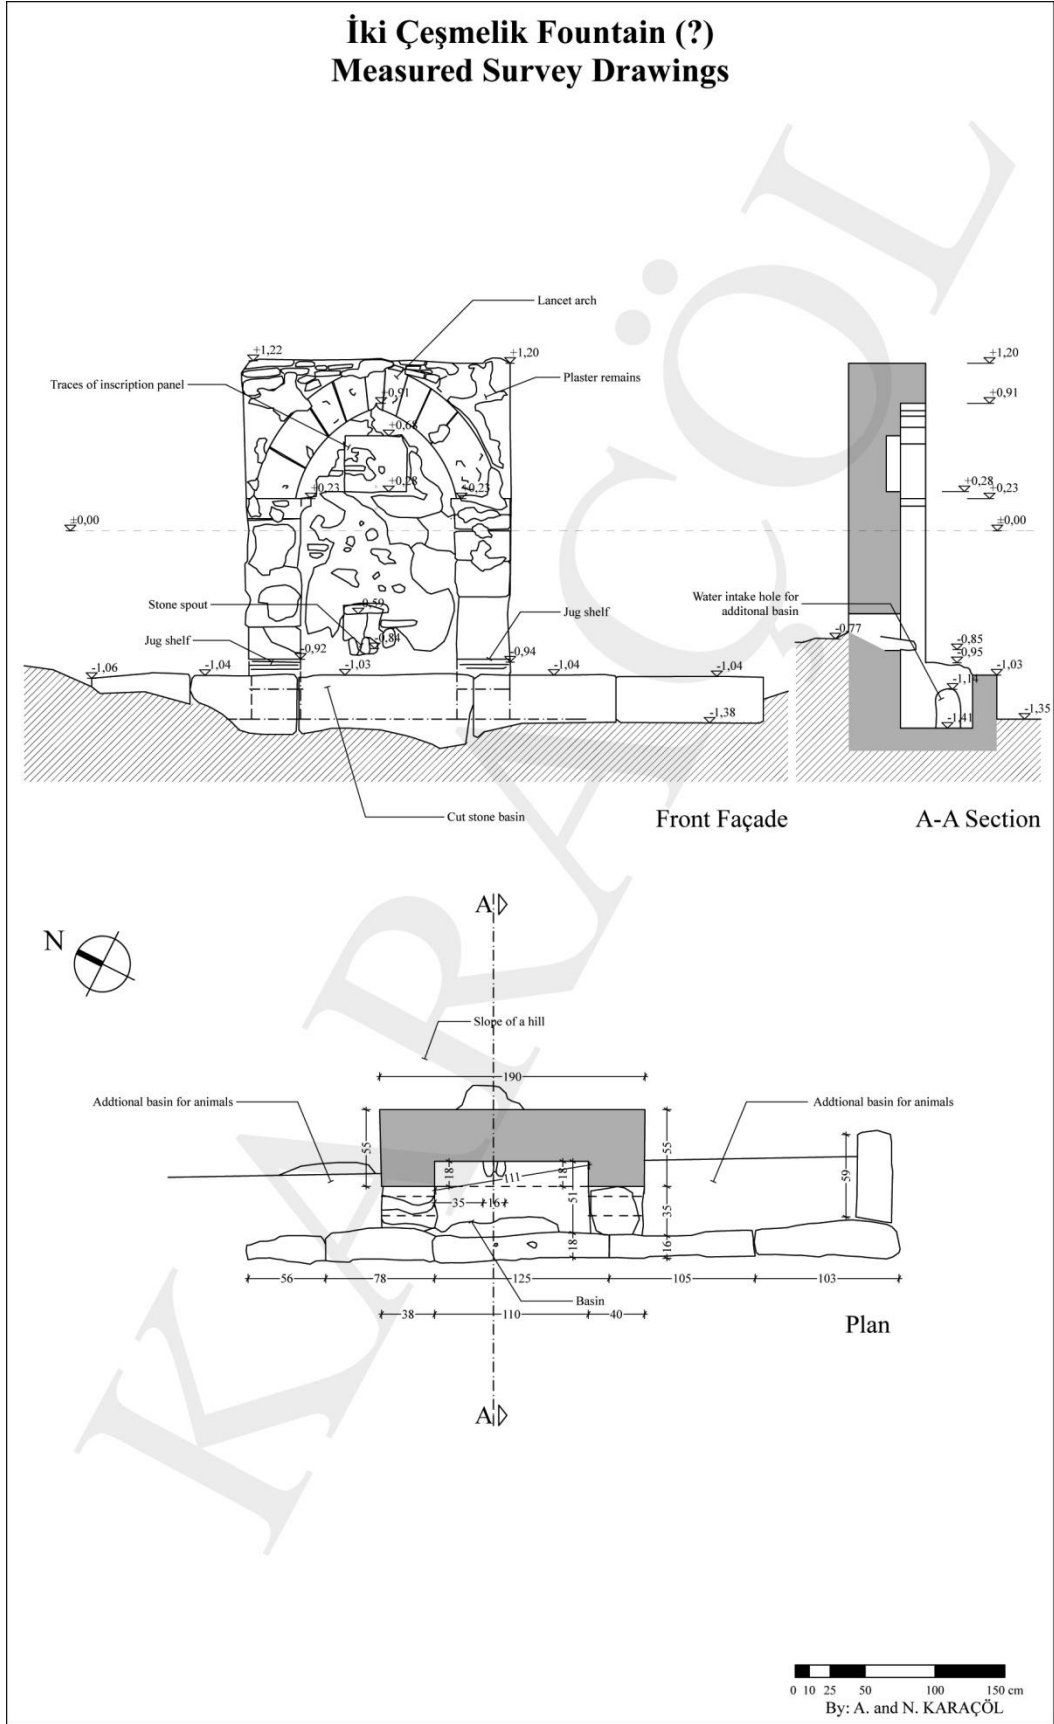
İki Çeşmelik Fountain front façade, section and plan drawings
